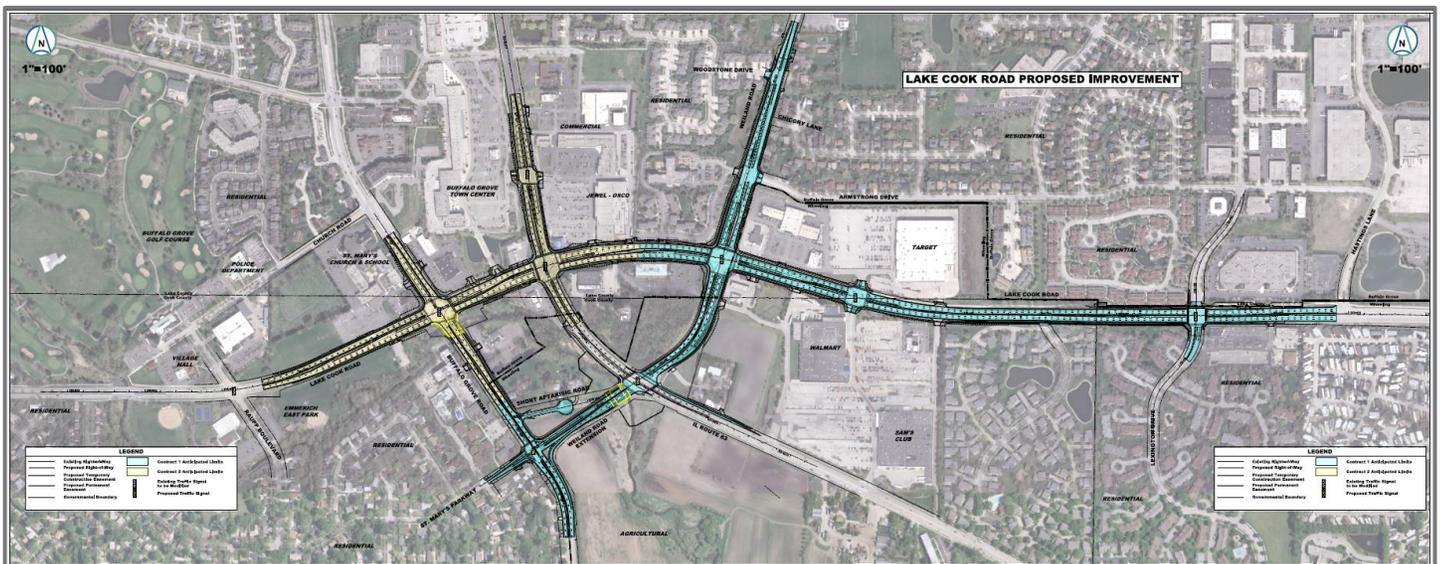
Weiland Road – Prairie Road/Lake Cook Road Phase 2 Improvements.
